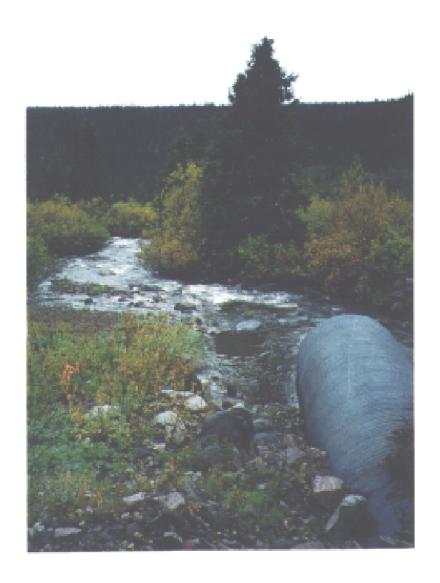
PAU CREEK AT CHENI MINE ROAD LOOKING SOUTH
